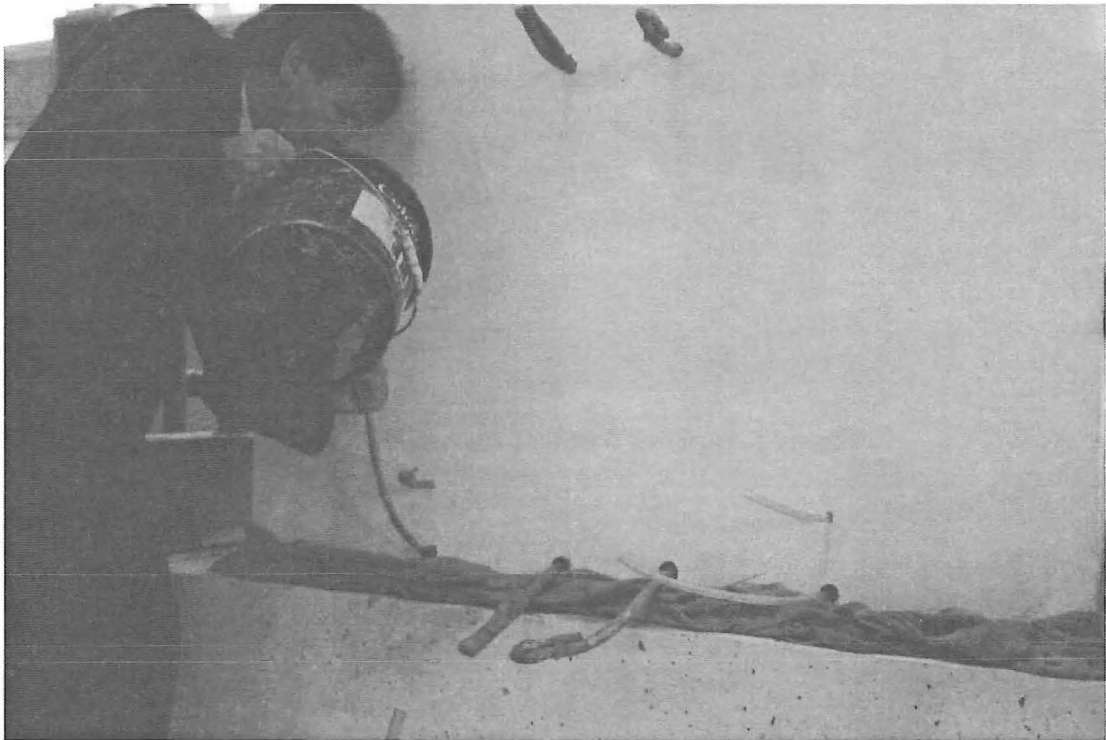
Grouting operation of energy dissipators and shear dowels prior to testing.
